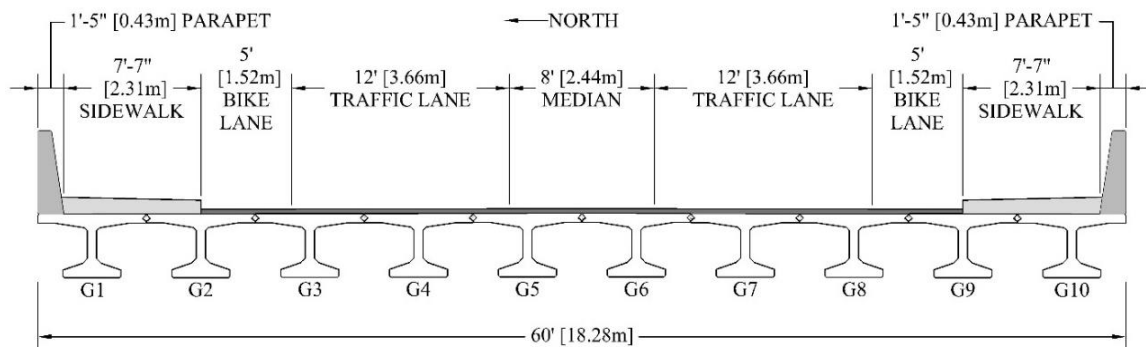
A cross-section of the Nibley Bridge at mid-span showing bridge dimensions.
